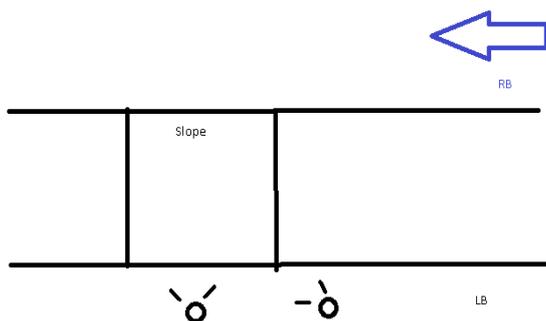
Site plan for Mereway Barrier 1
